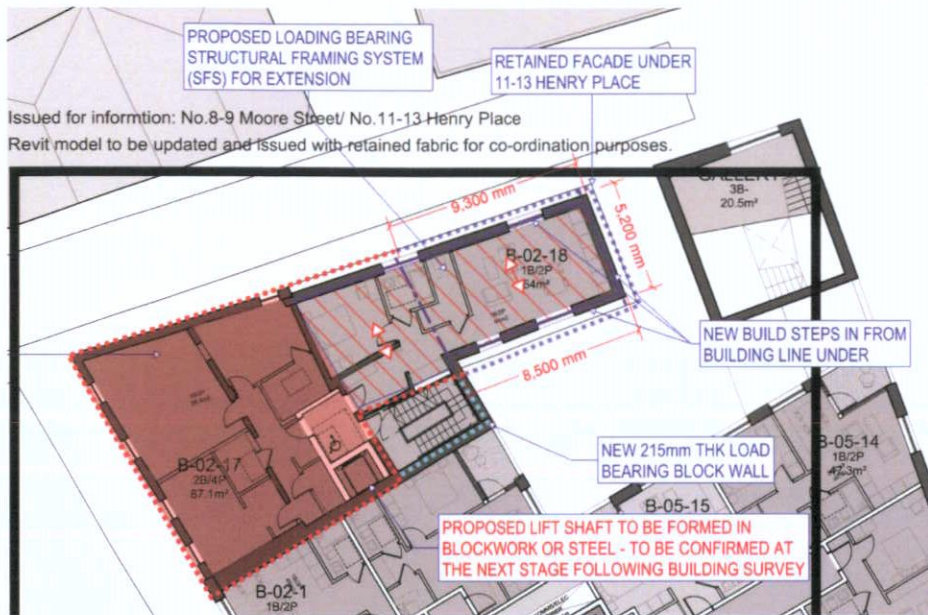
Steel at 2nd Floor to Support Extension Over 11-13 Henry Place.
